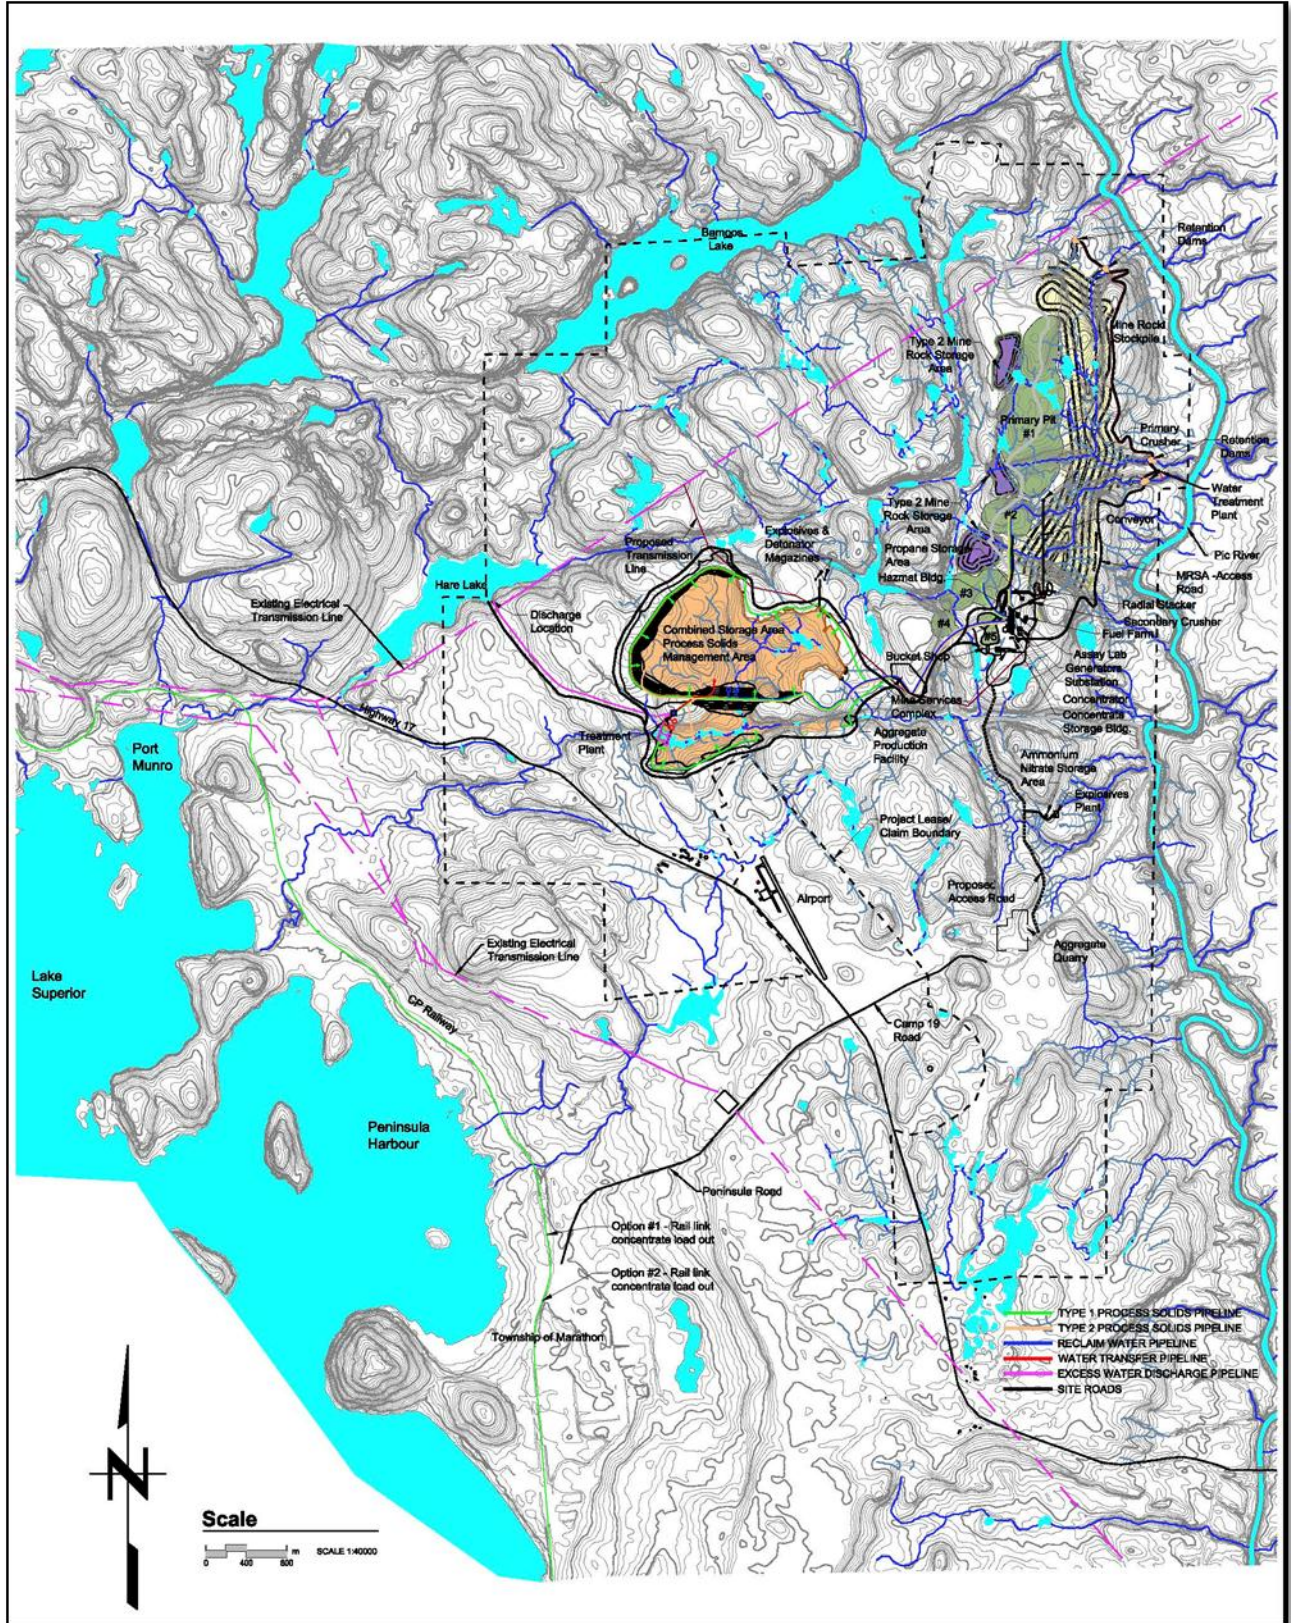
Marathon PGM-Cu Project Conceptual General Site Layout
